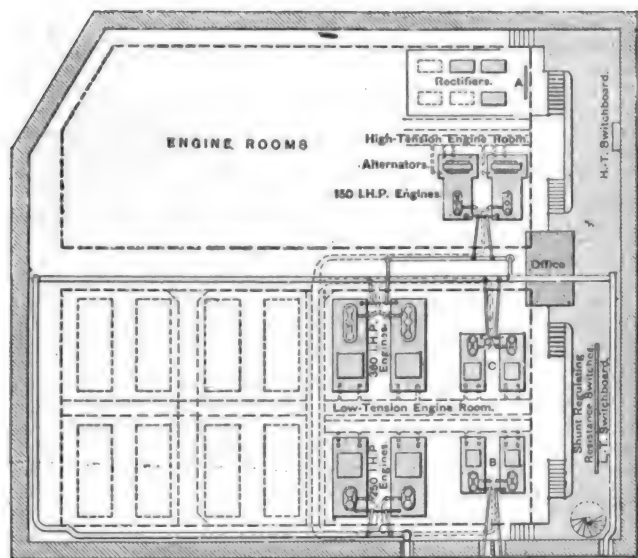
PLAN OF ENGINE ROOMS.—“A,” ARC LIGHT SWITCHBOARD; “B,” BALANCING MACHINES; “C,” CHARGING MACHINES.
